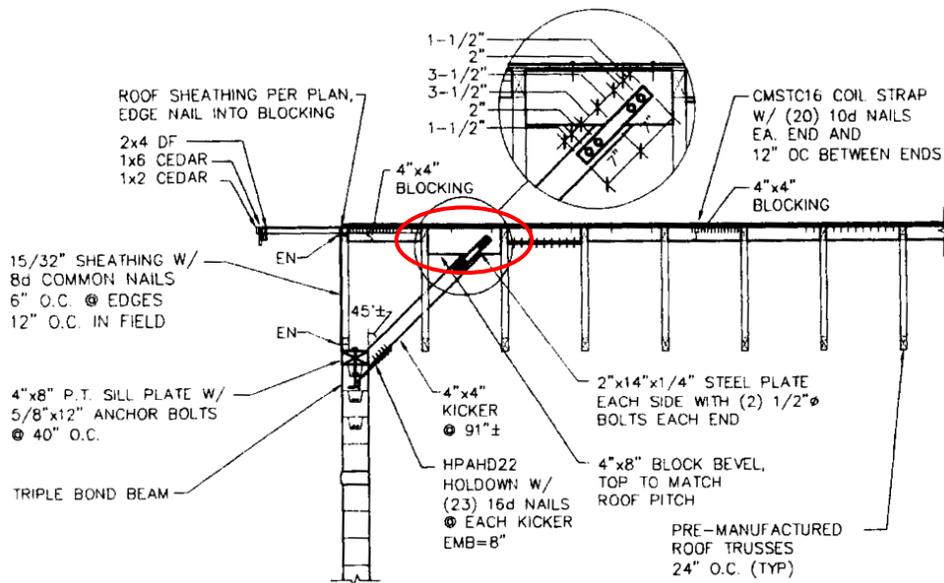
Inadequate Connection between Blocking and Roof Truss
